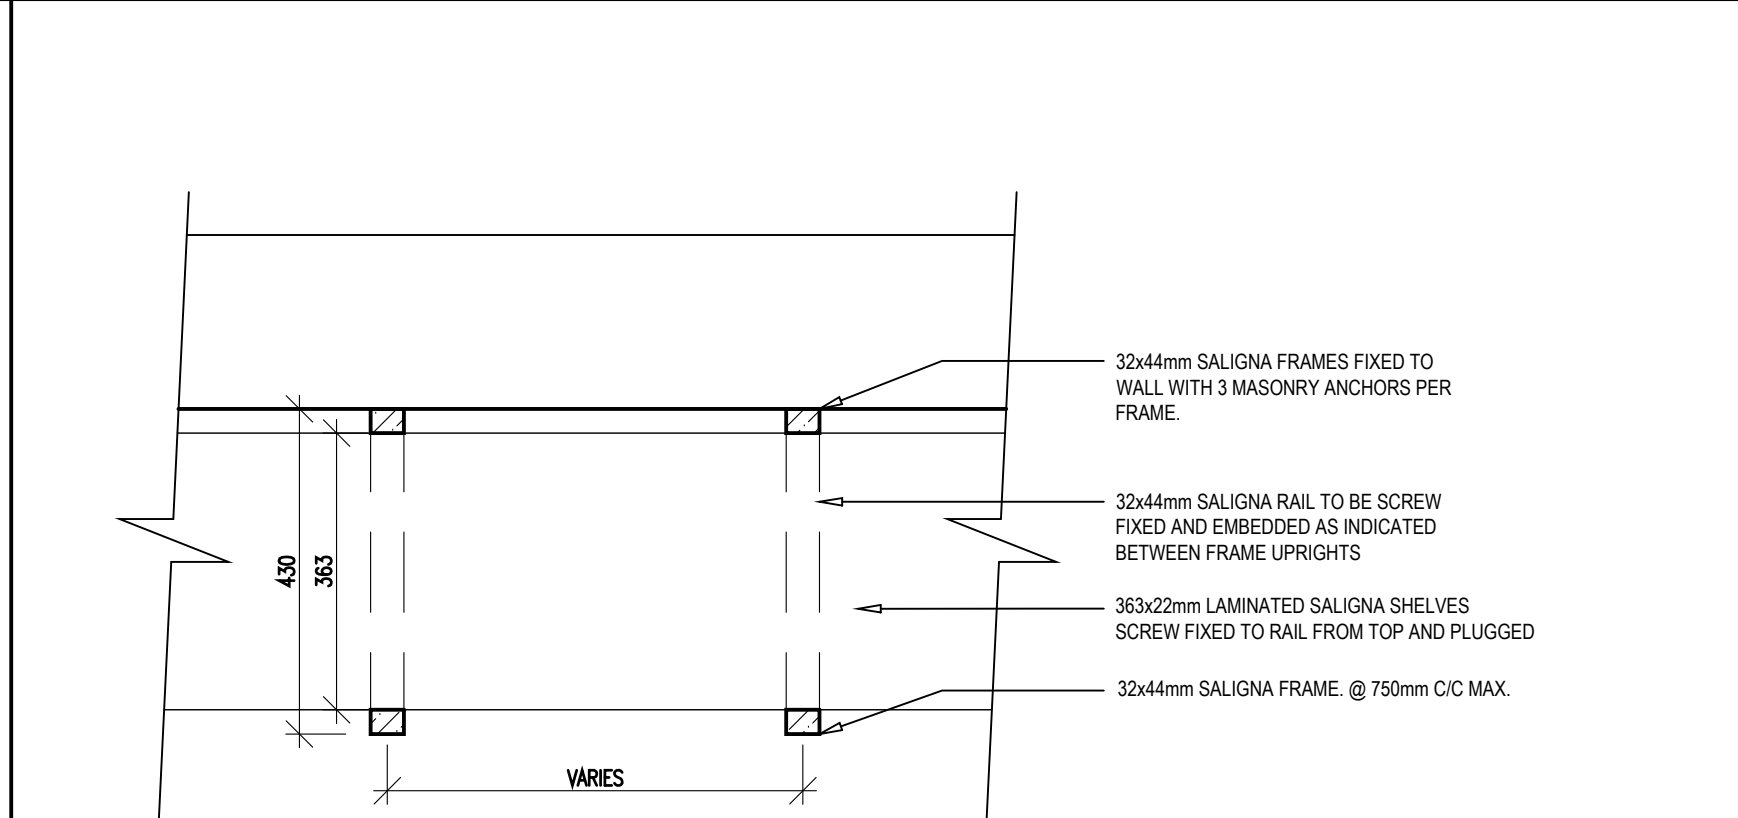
VEG STORE SHELVING SECTIONAL ELEVATION B SCALE 1:20
